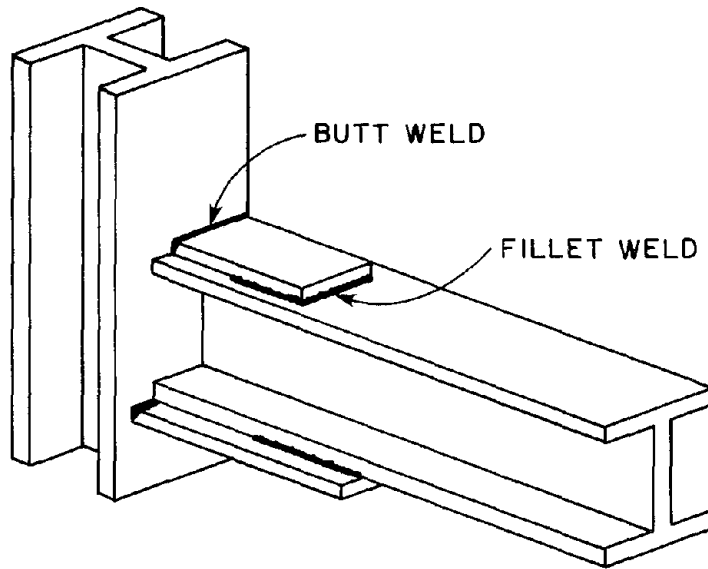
WELDED TOP AND BOTTOM PLATE CONNECTION
